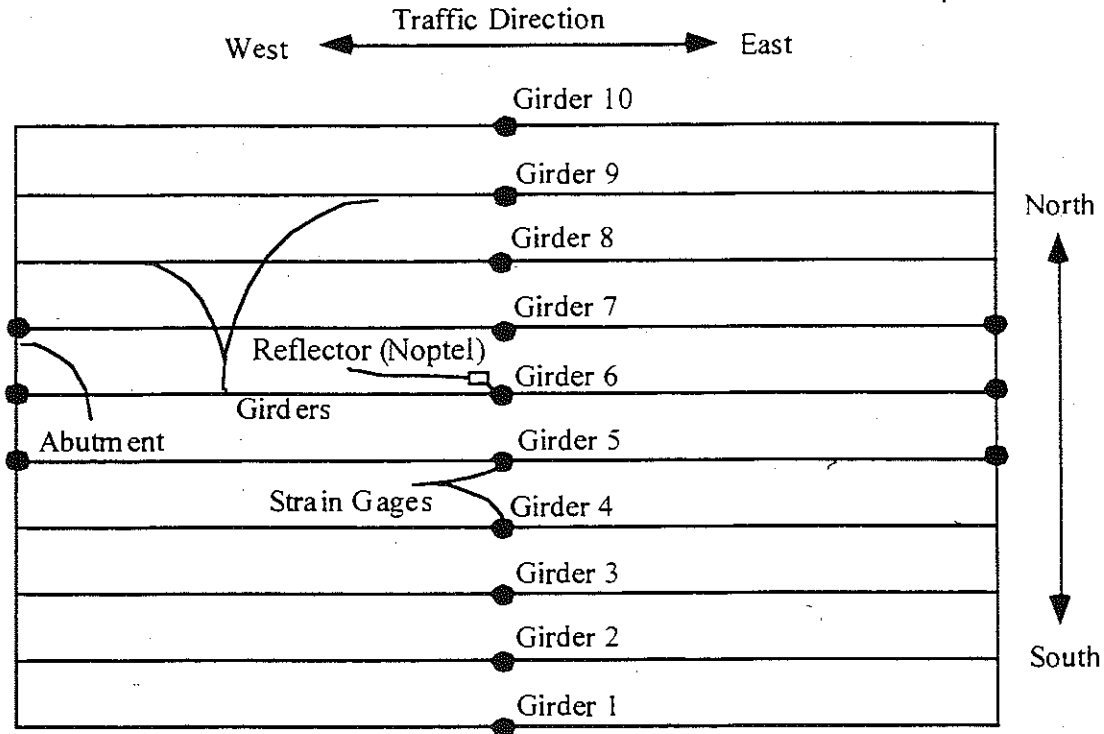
Strain Gage Locations in Bridge M82/TC (B01-59041).
